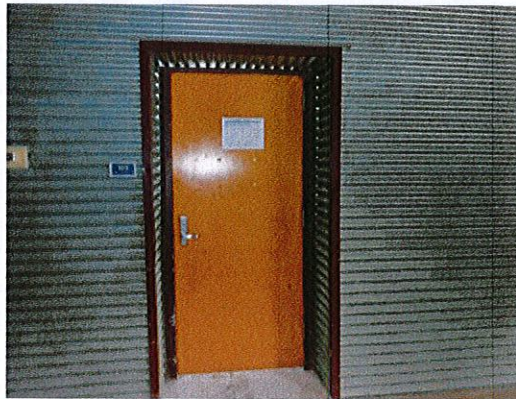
Patch the accessible route to eliminate any changes in elevation greater than 1/2".
